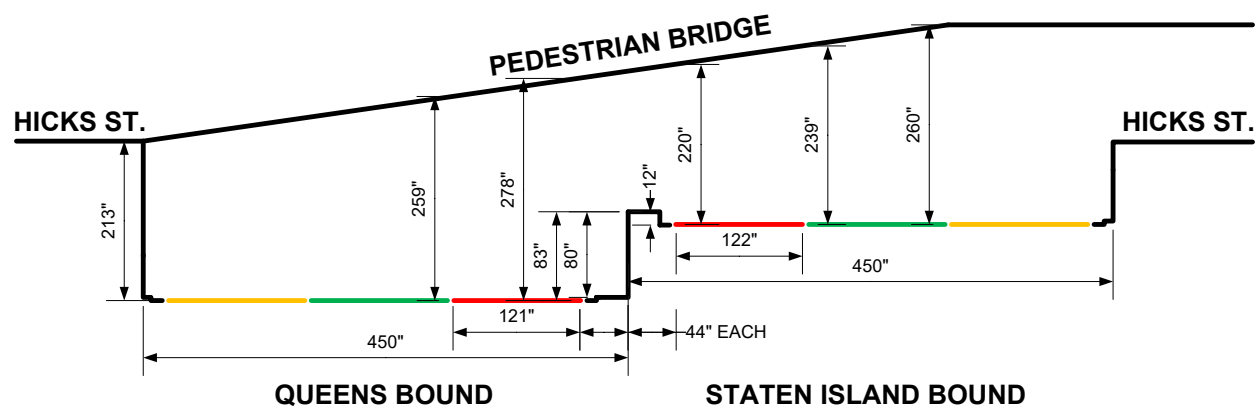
Roadway Dimension and Cross Section of BQE at Summit Street
